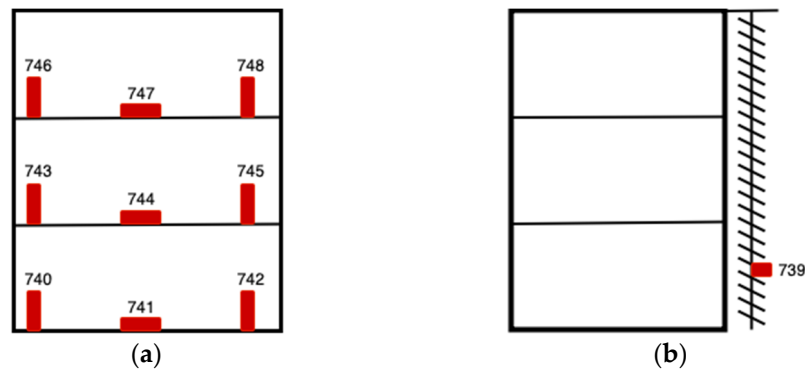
Deployment of data loggers: (a) nine loggers near windows indoor—three for each floor (front view); (b) one data logger outside on the façade construction (left side view).
